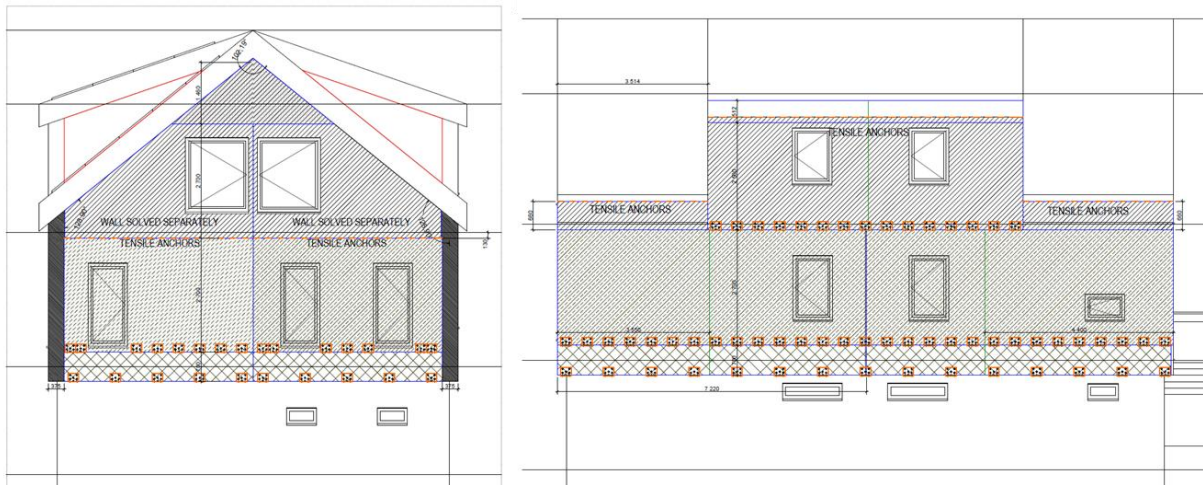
SCHEME OF THE ANCHORS. ELEVATIONS
